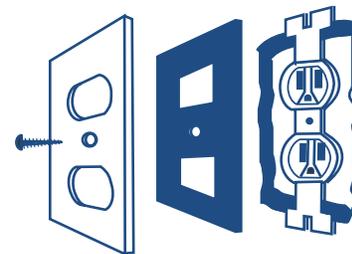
Outlet gaskets are installed between the electrical outlet and the coverplate. Plastic plug inserts will also prevent air from entering your home.
